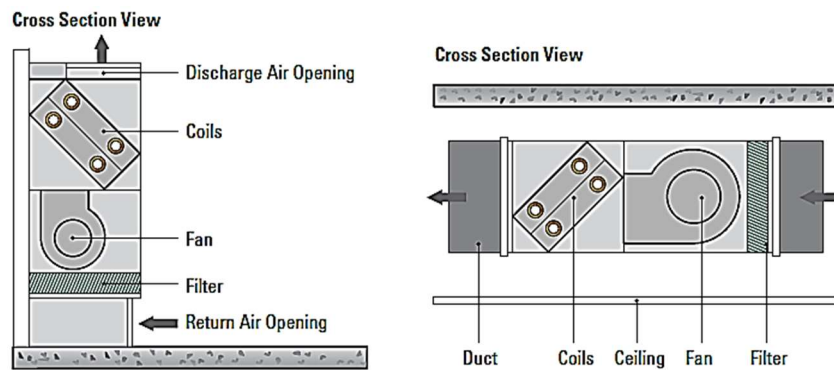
Fan Coil Units (Source: Engineering Guide Fan & Blower Coils)
